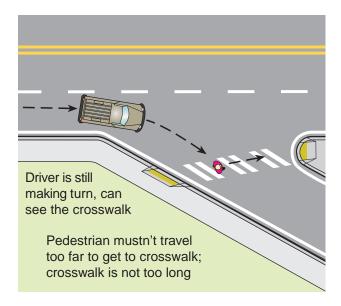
Crosswalk placed midway between direct and shortest routes
